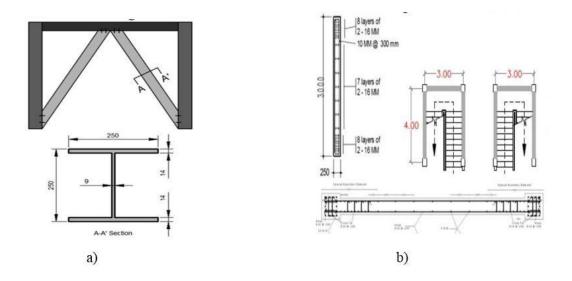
Specification detail of a) steel bracing and b) shear wall[16] Structural analysis using ETABS v9.7.1 was carried out after strengthening the building and they concluded that, retrofitting of the building by adding steel bracing and shear wall systems are very effective for reducing the displacement by 60-99% and the internal force by 10-95% compared to the existing structure [16].
